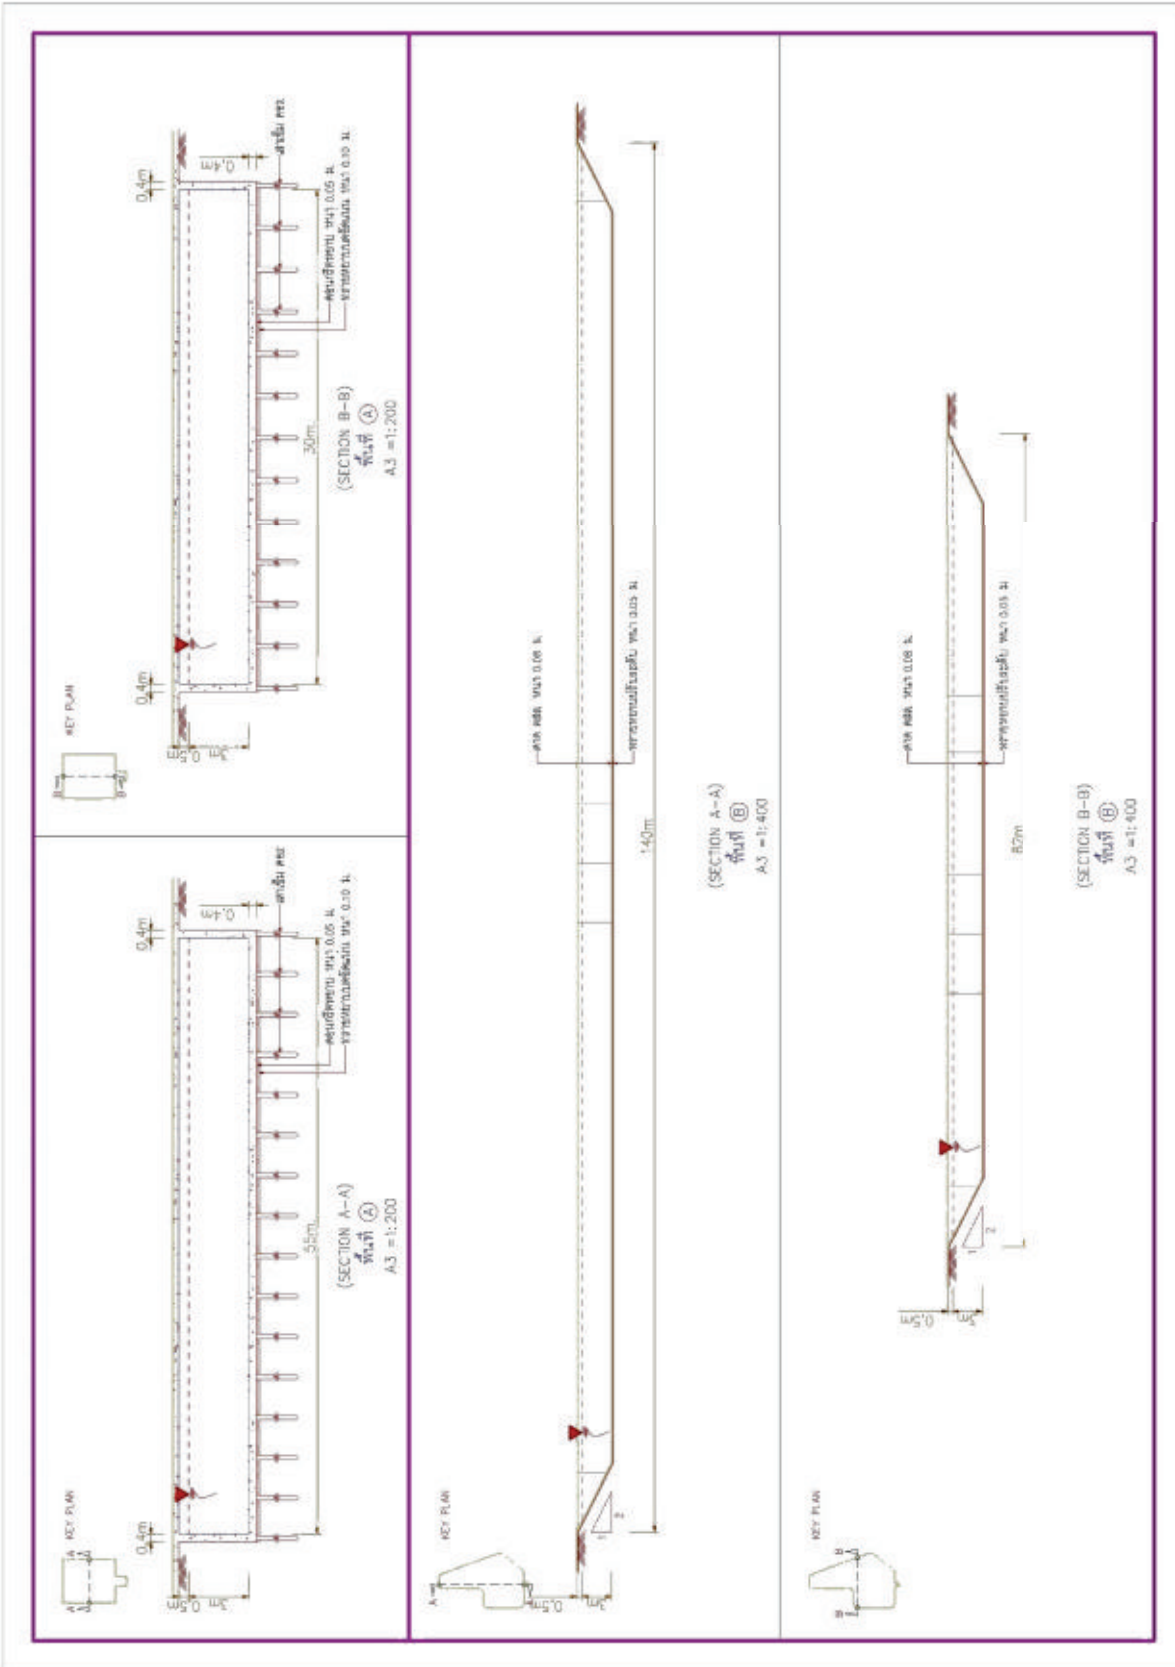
Longitudinal Section of Water Retention Pond
